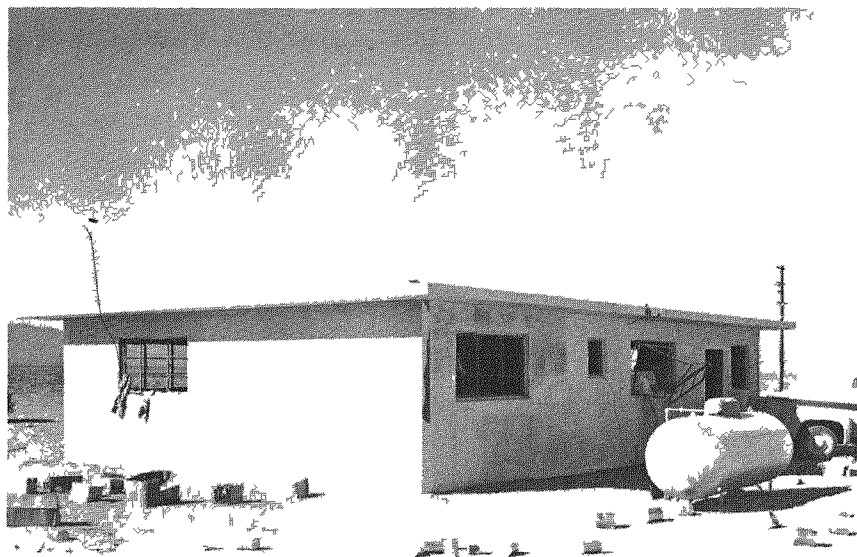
38 Reinforced precast concrete house after a nuclear explosion (5 psi overpressure). The LP-gas tank, sheltered by the house, is essentially undamaged
